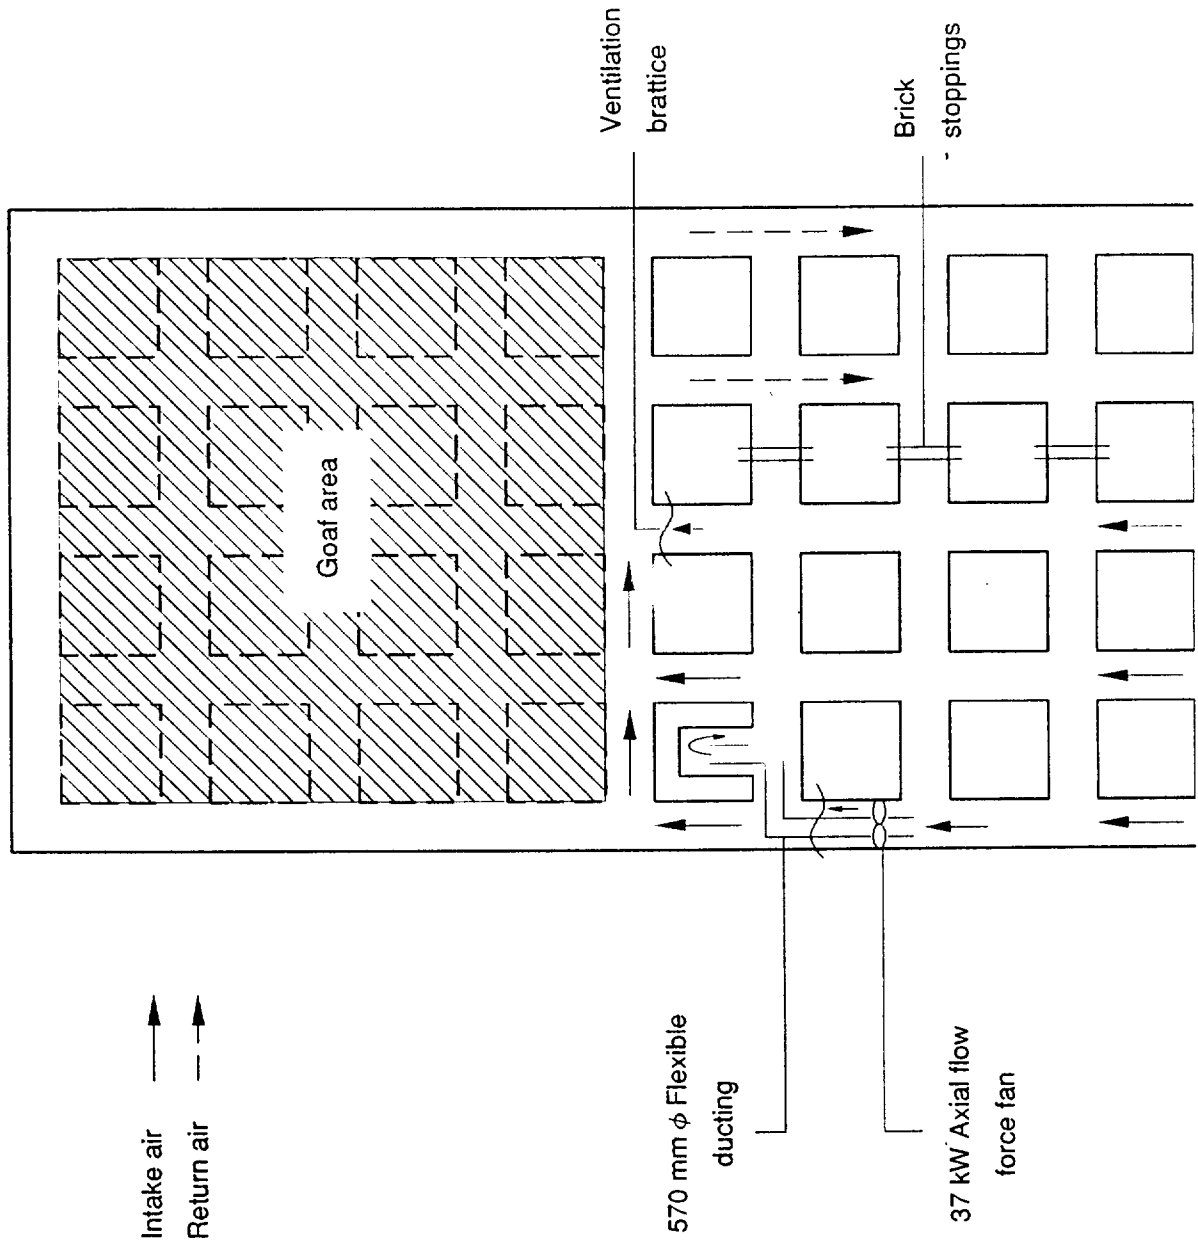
Ventilation layout during pillar extraction using no bleeder road.
